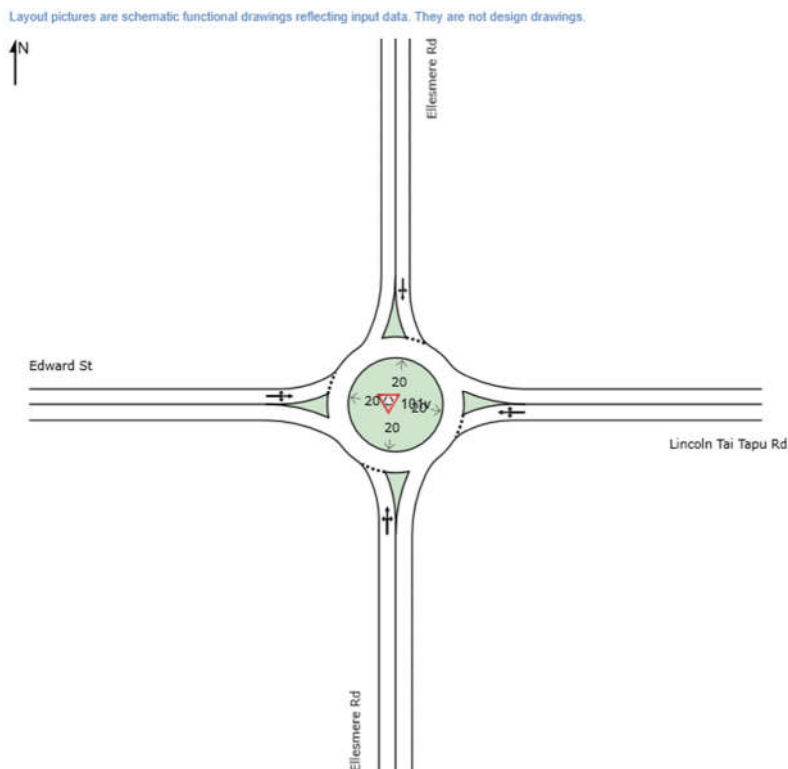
Edward St / Ellesmere Rd / Lincoln Tai Tapu Rd – Roundabout Concept
